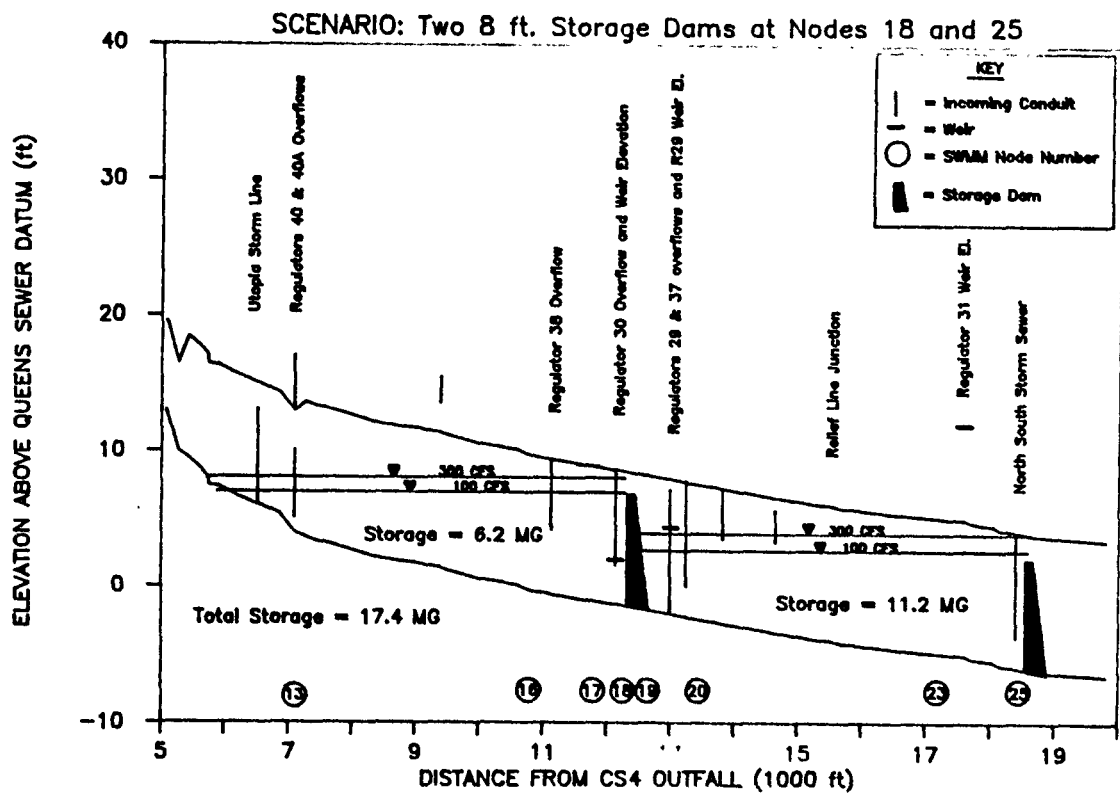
In-line storage backwater profiles for Kissena Corridor storm sewer.
